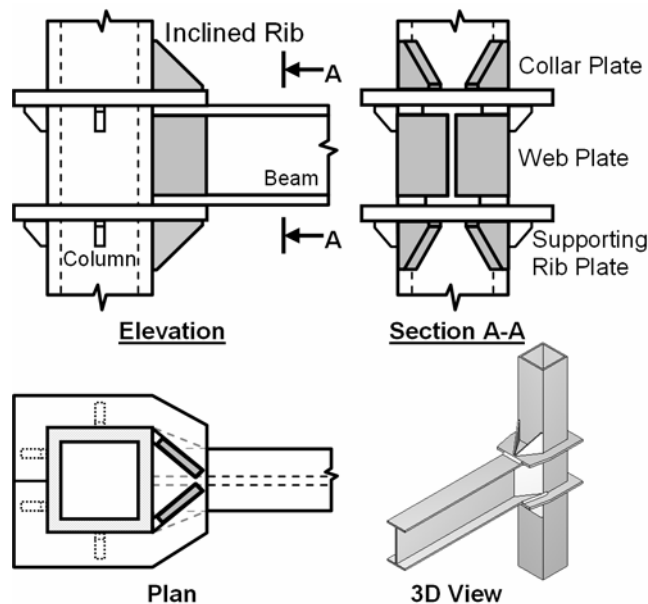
Inclined rib-plated collar-plated IBBC connection configuration with additional web plates. The supporting small rib plates below collar plates are only to facilitate proper welding of the collar plates to the column.
